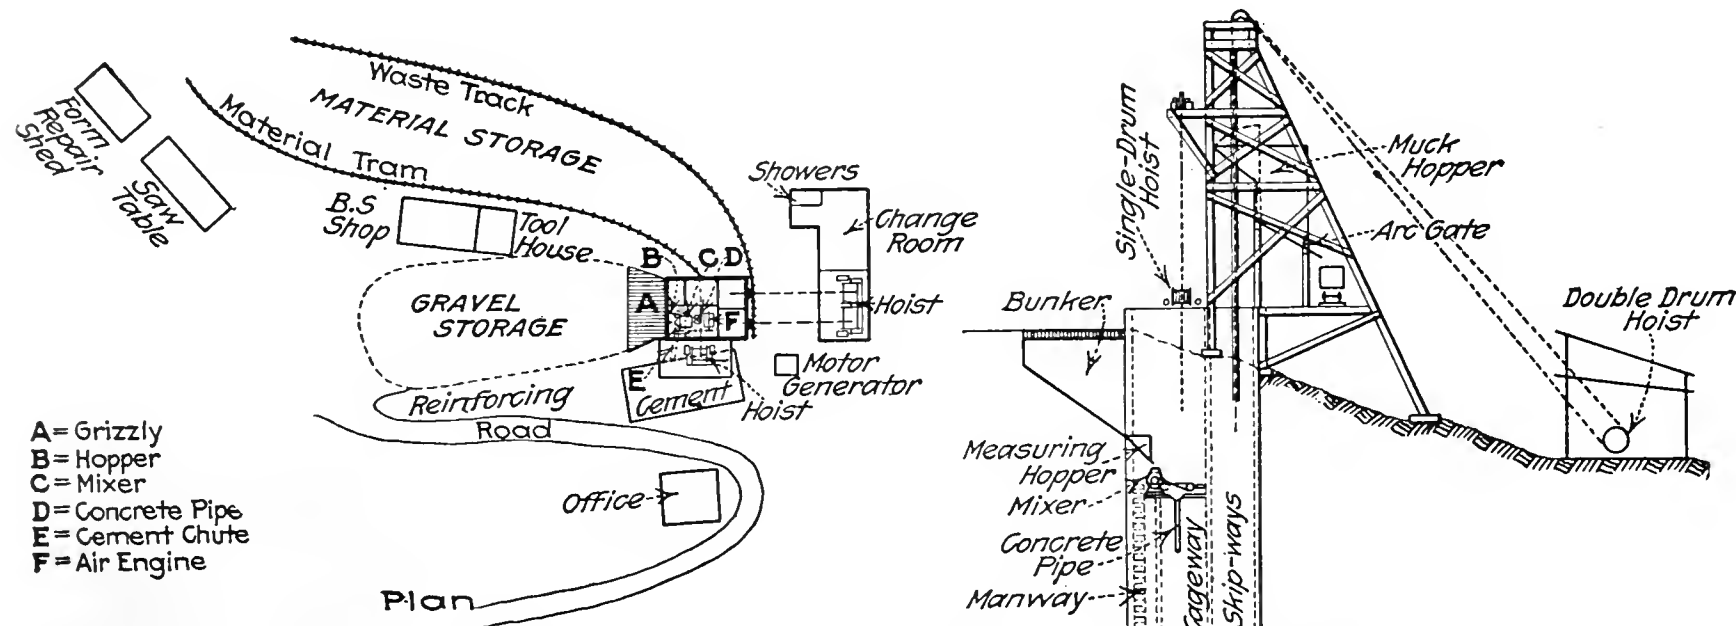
PLAN OF CONSTRUCTION-PLANT LAYOUT FOR SINKING AND CONCRETING MINE SHAFT
